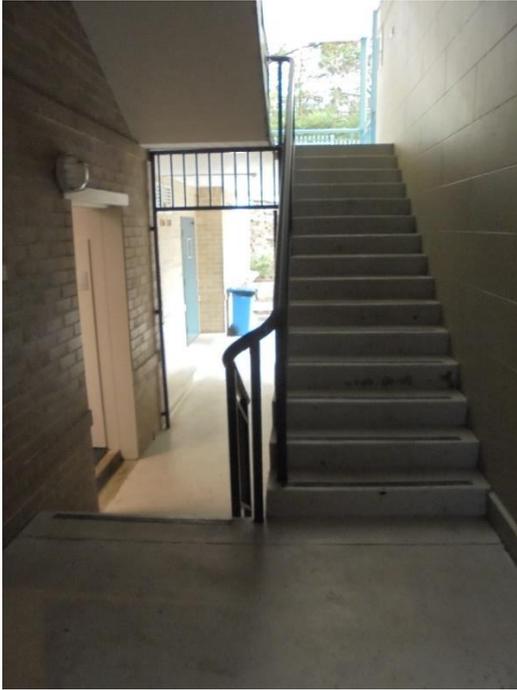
View of the existing external stair between the northern addition and Wyalla, linking Levels 1, 2 and 3, would be enclosed as part of the Stage 1 works, November 2017. The render marked out to replicate ashlar stone would remain.
